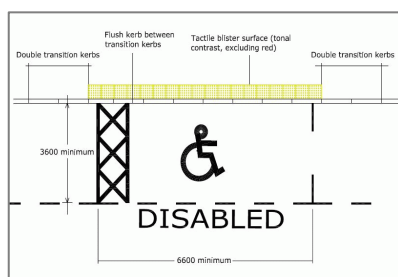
Accessible on-street parallel parking space "e.g. in the town center" [73], [66].
